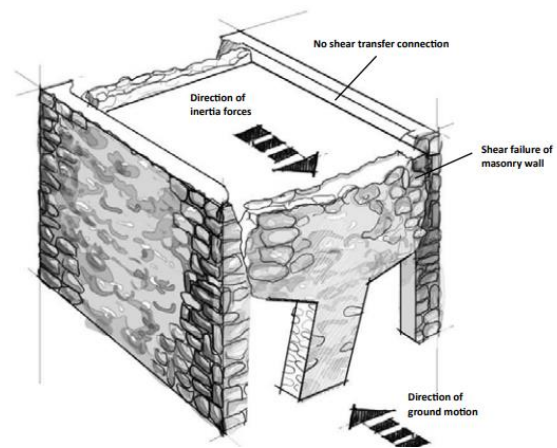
Failure due to inadequate wall-floor connection (Bothara & Brzev, 2011)
